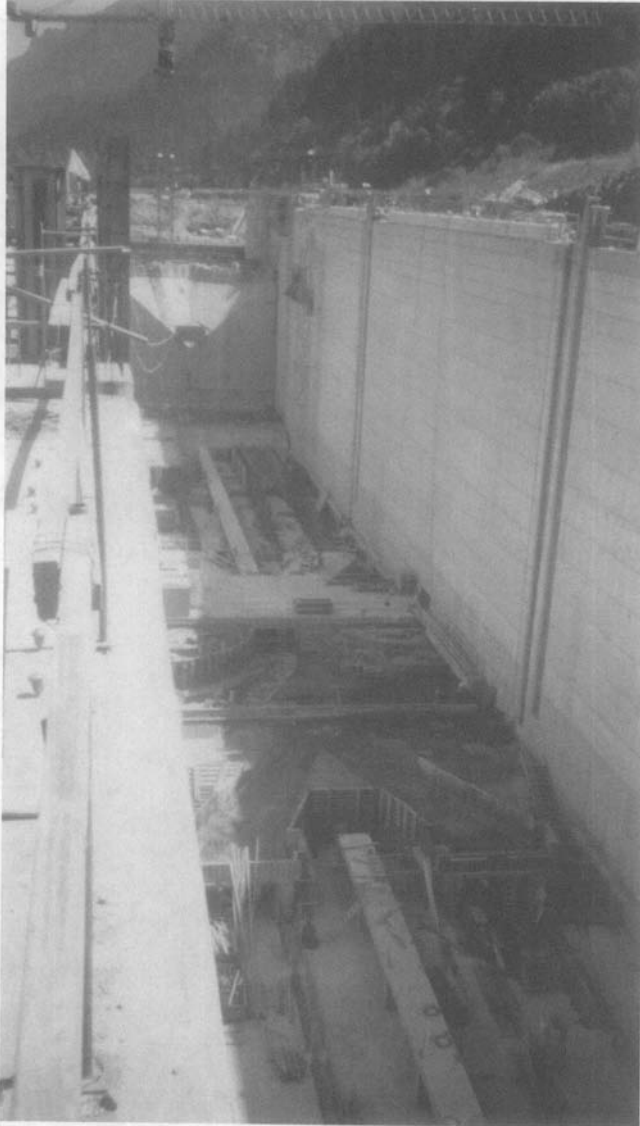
Bonneville Lock, Lock Chamber Under Construction.
